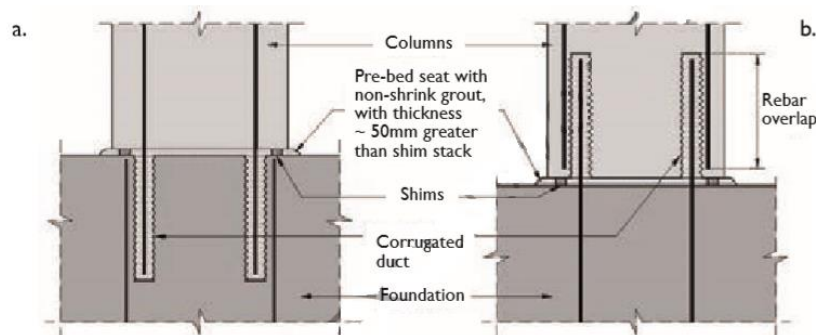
Column-to-foundation connections with corrugated metal ducts (Other details not shown for clarity)
